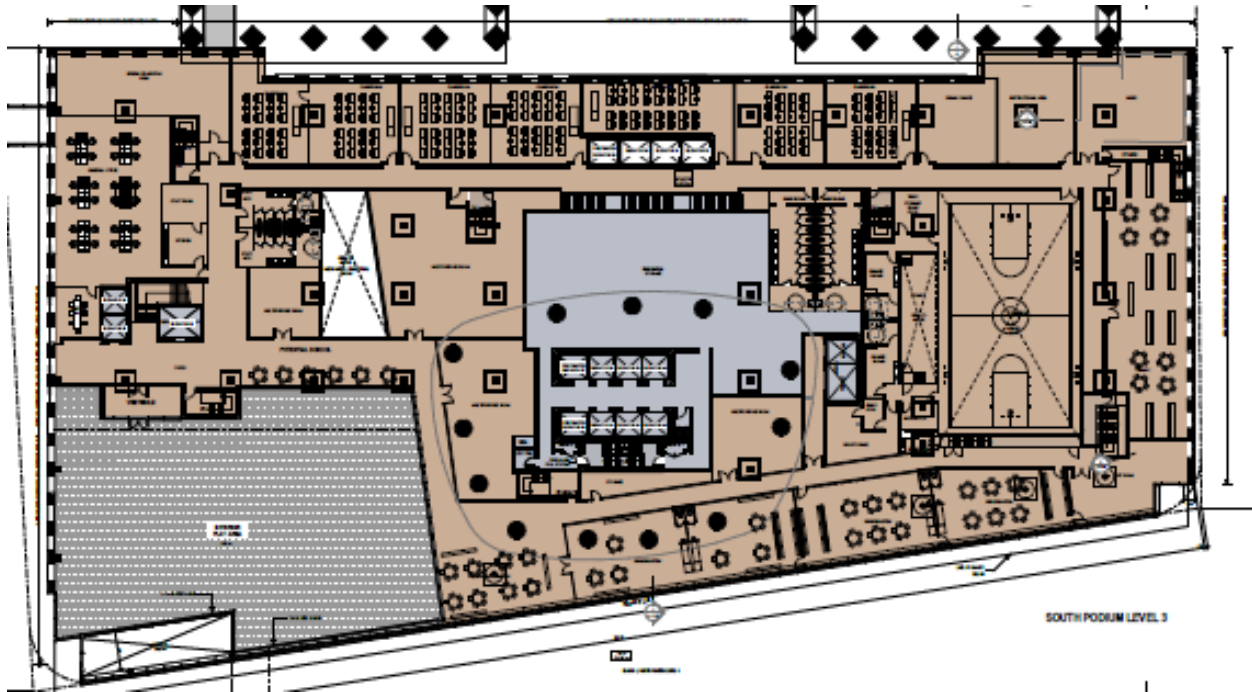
3rd Floor Plan (2021 Site Plan Application submission)
